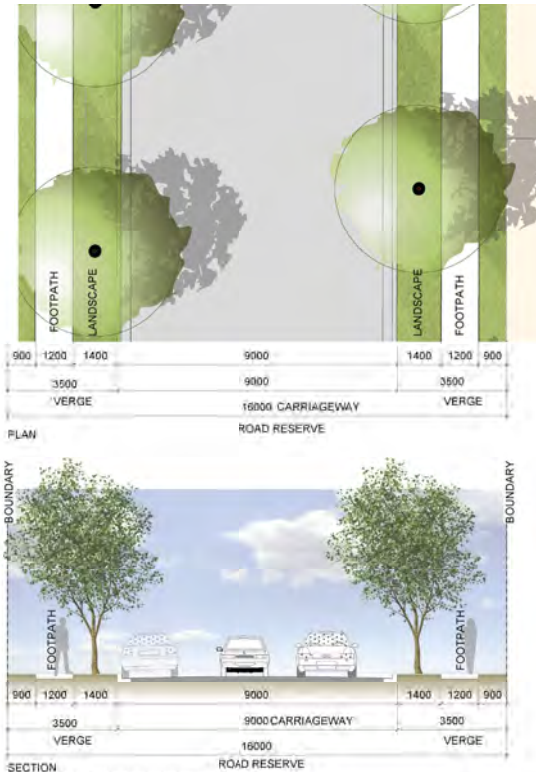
Typical Detail: Local Road (Major Without Cycleway)
